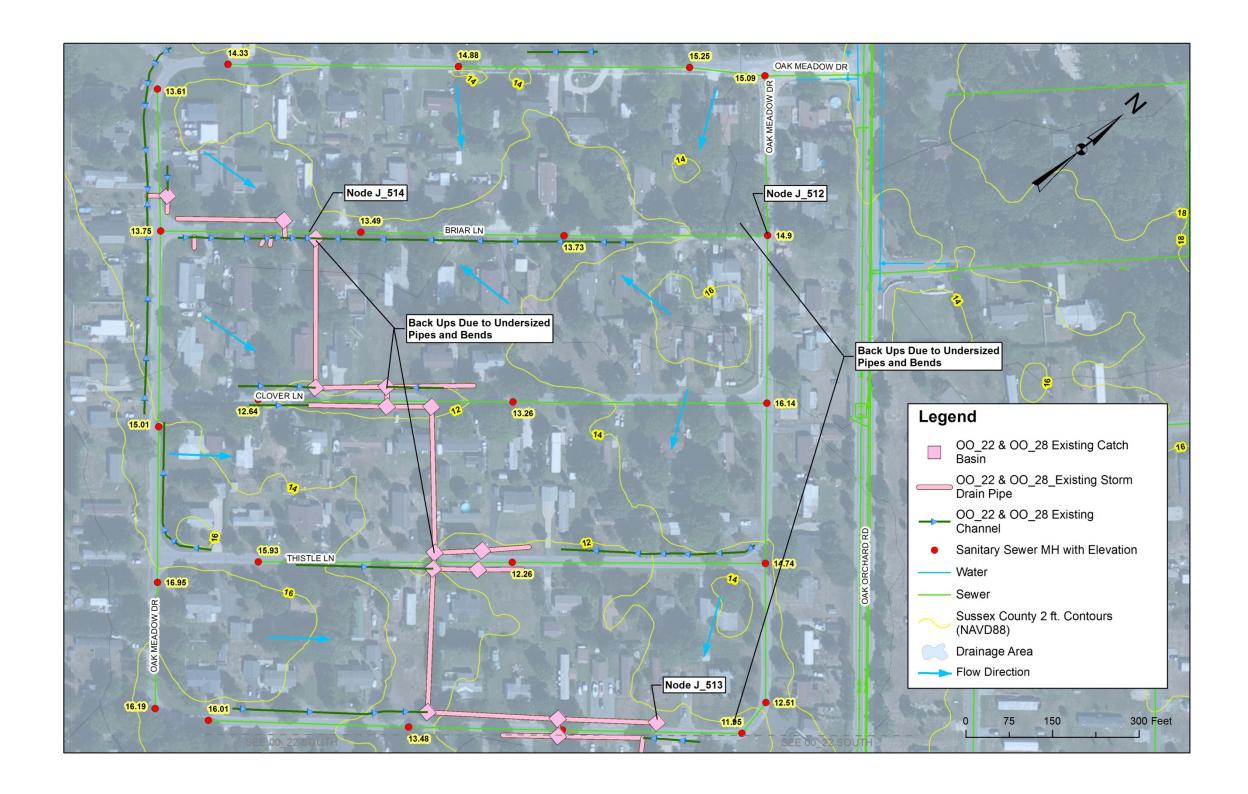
OO_22 / OO_28 North Existing Site Conditions
